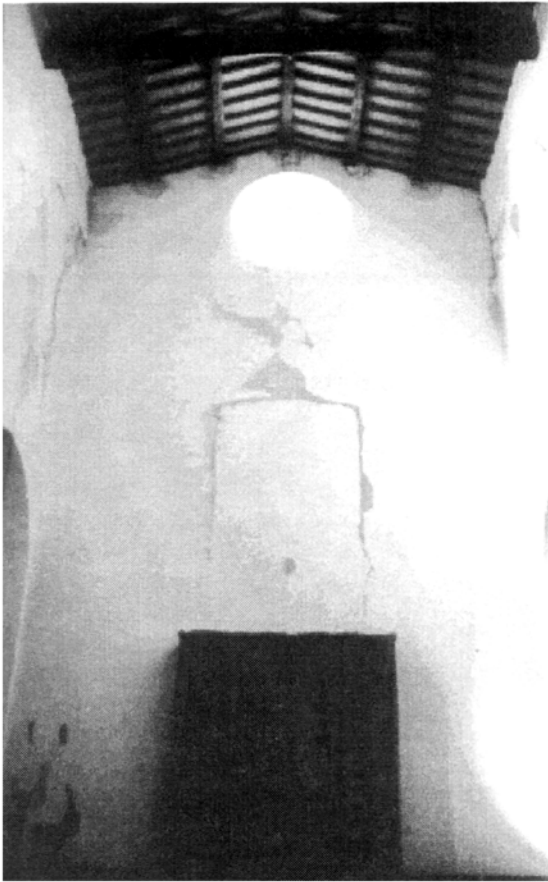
Santa Maria Maggiore: internal elevation of the façade; damage caused by oscillation of the façade out-of-plane
